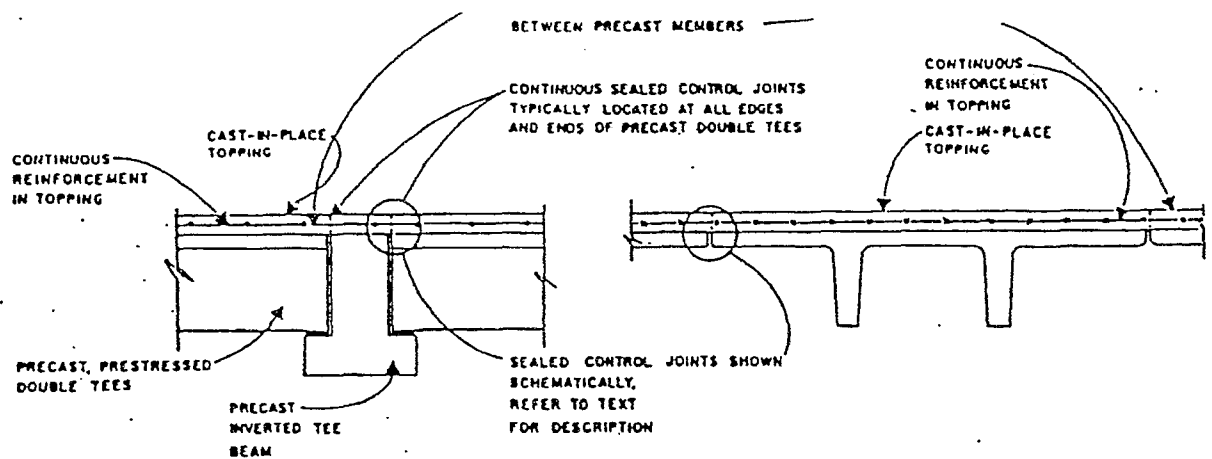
Location of some sealed control (construction) joints in topped precast prestressed double-tee parking structure.
